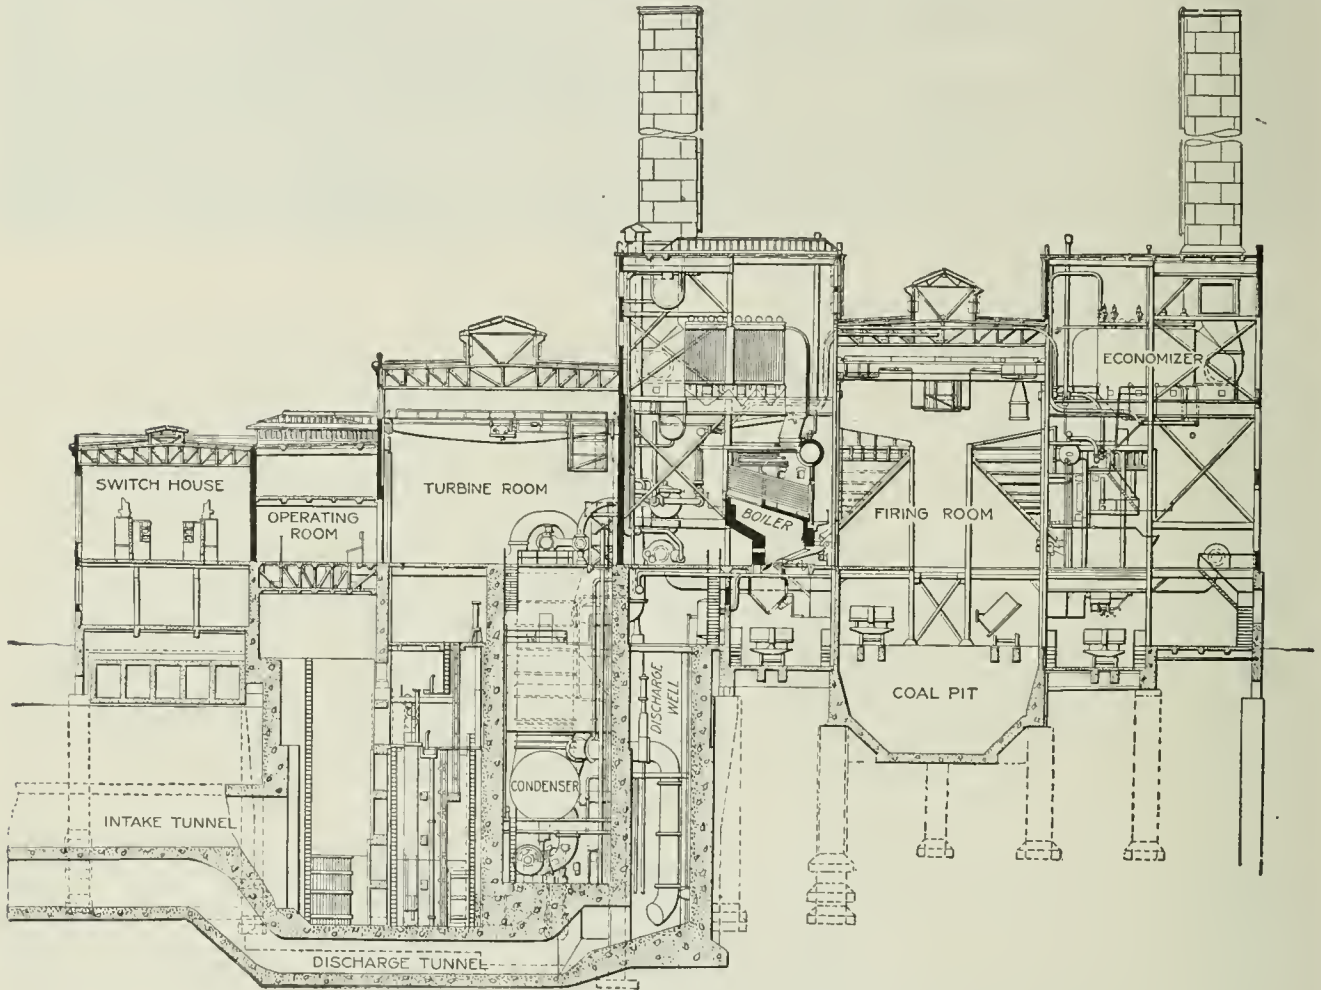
ELEVATION OF THE WINDSOR PLANT
